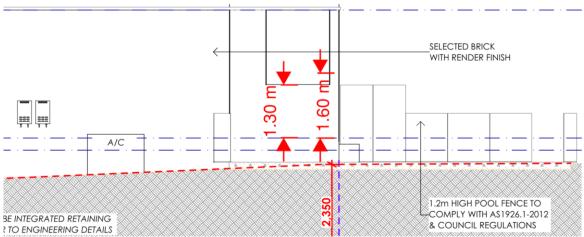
Markup of south elevation plan (Source: Fyffe Design)
